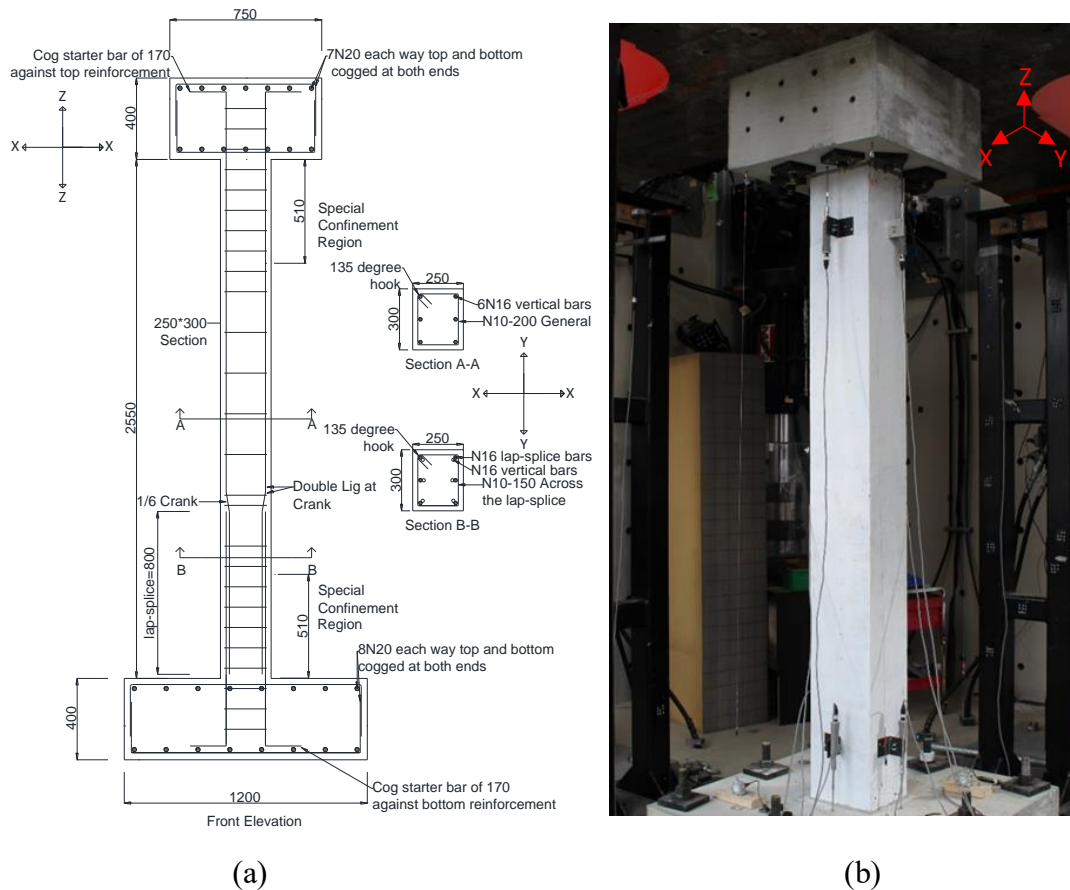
(a) Details of RC column (mm) (b) Specimen under multi-axial substructure testing (MAST) facility
